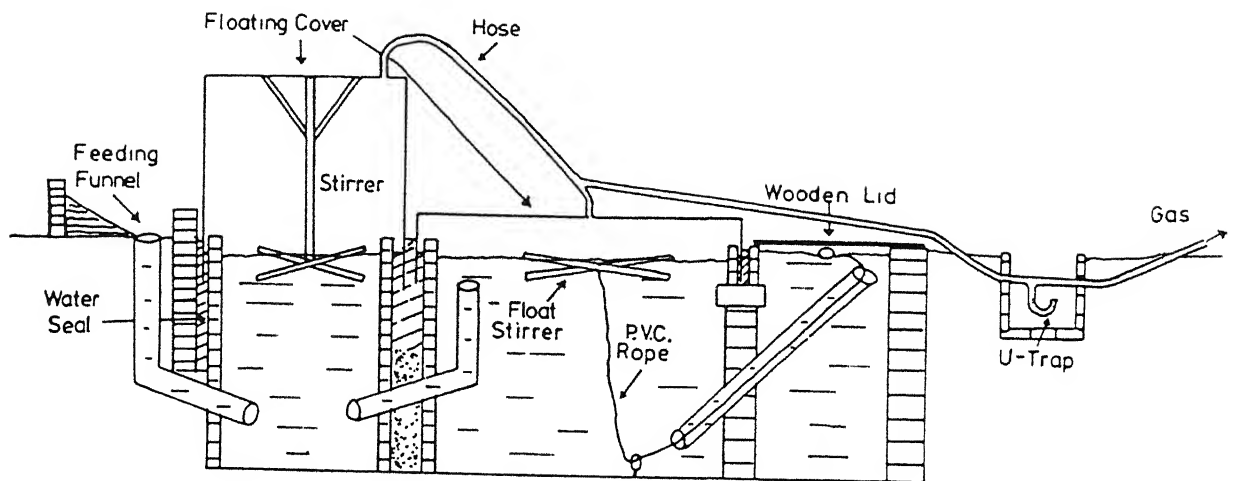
Typical Taiwanese Design of a Biogas Plant
